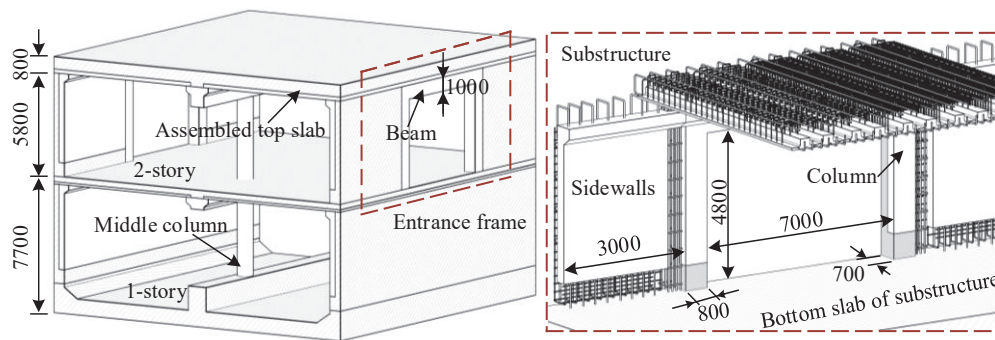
Schematic illustration of the full-scale subway station (units: mm).
